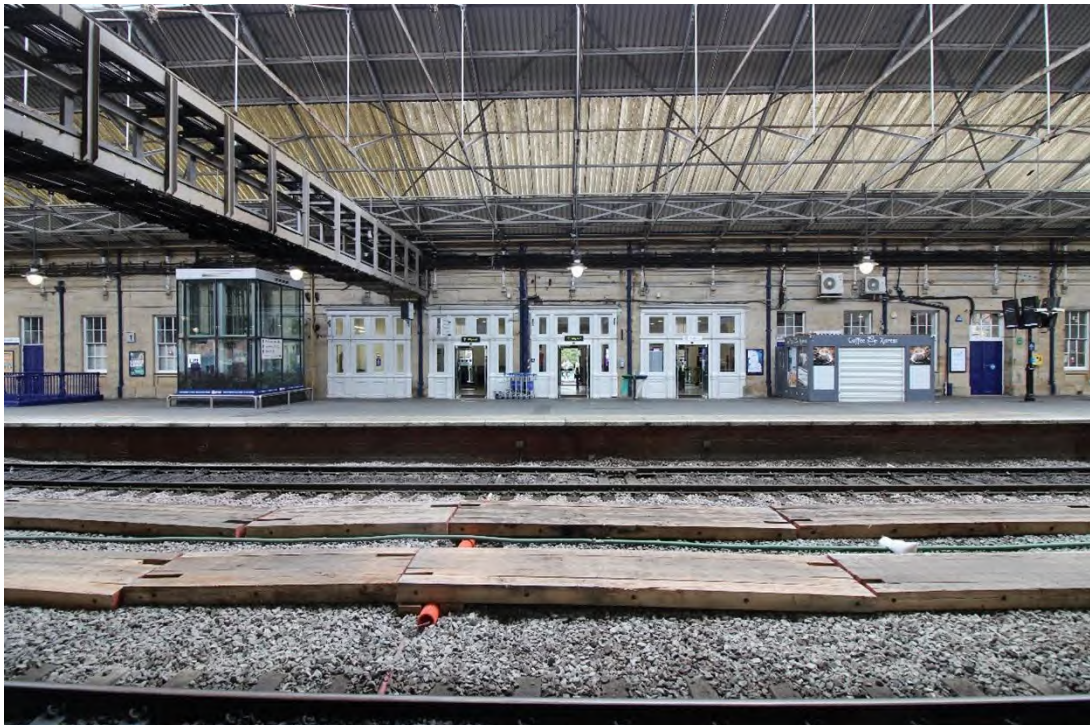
Central section of eastern elevation (western elevation of station), facing east
